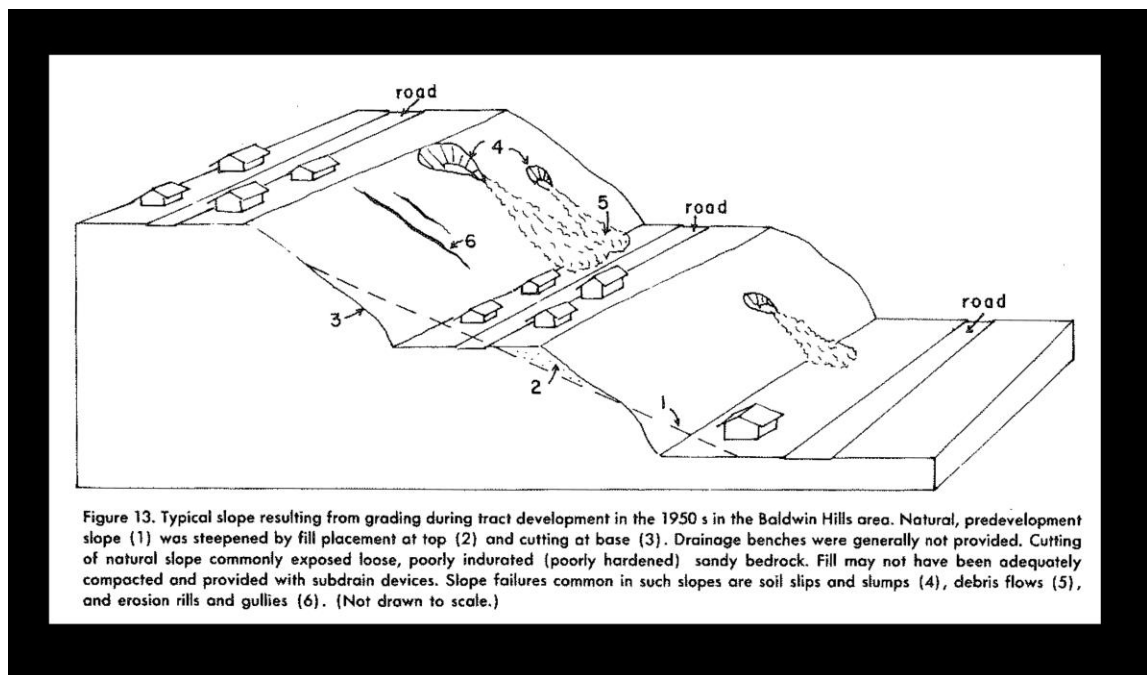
Illustration of typical existing slope failures in Culver Crest. Image from Special Report 152.
